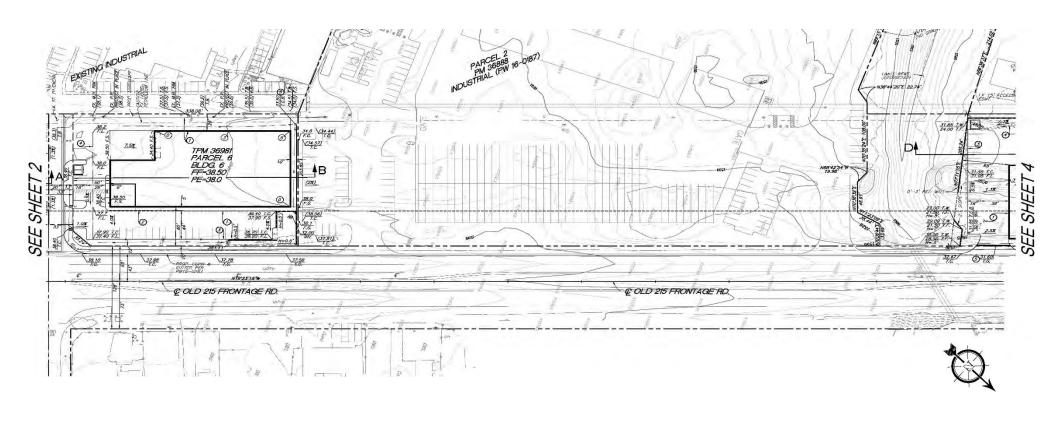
Project Plans (Preliminary Grading Plan)
